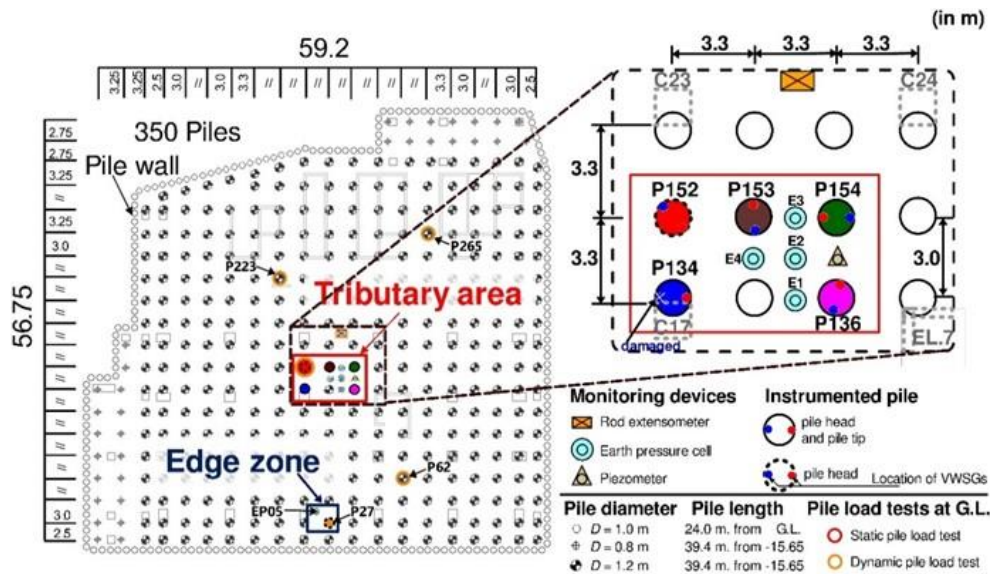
Layout of piles, pile wall and location of monitoring devices
